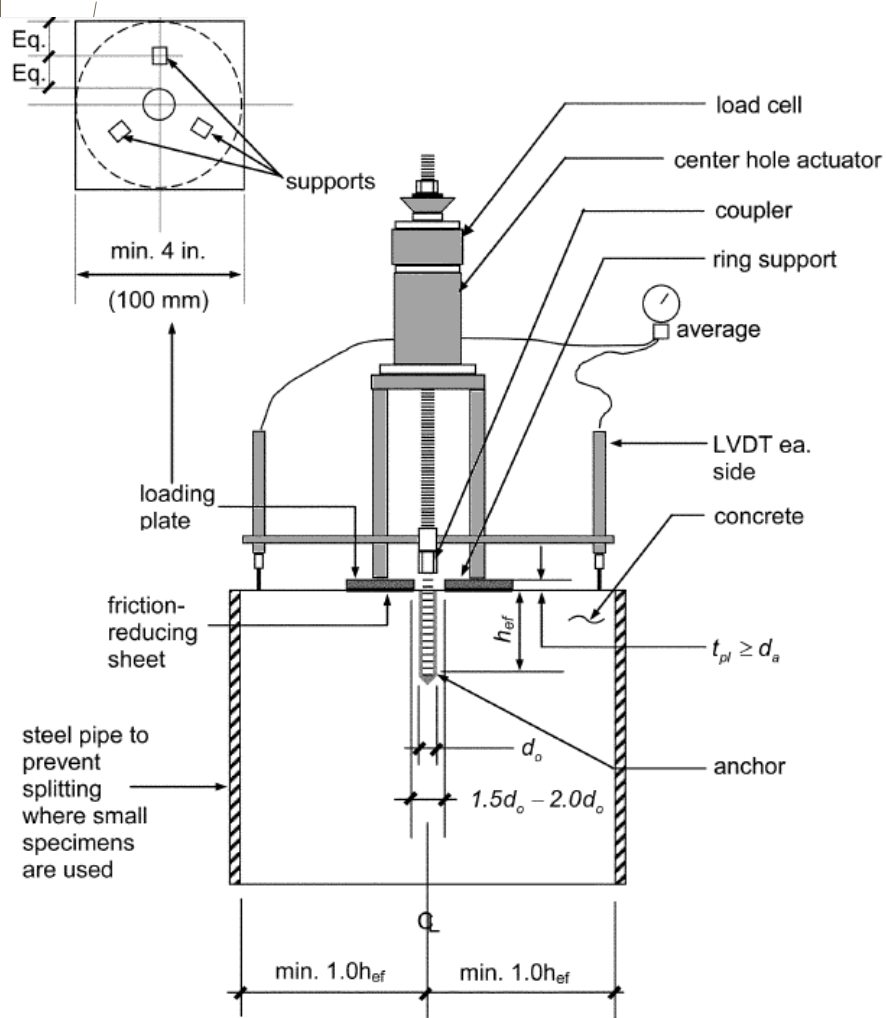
Example of confined tension test setup for adhesive anchors.
